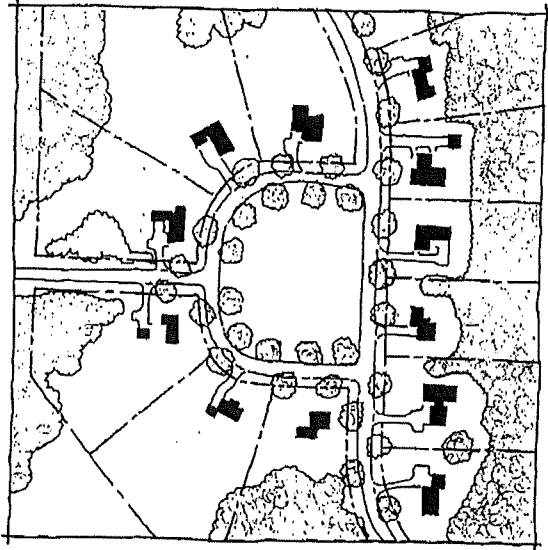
B Concept Plan – Illustrates lot layout and open spaces. Future development, natural habitat, pedestrian corridor, and neighborhood recreation open spaces are located on the development site according to their type of use.
